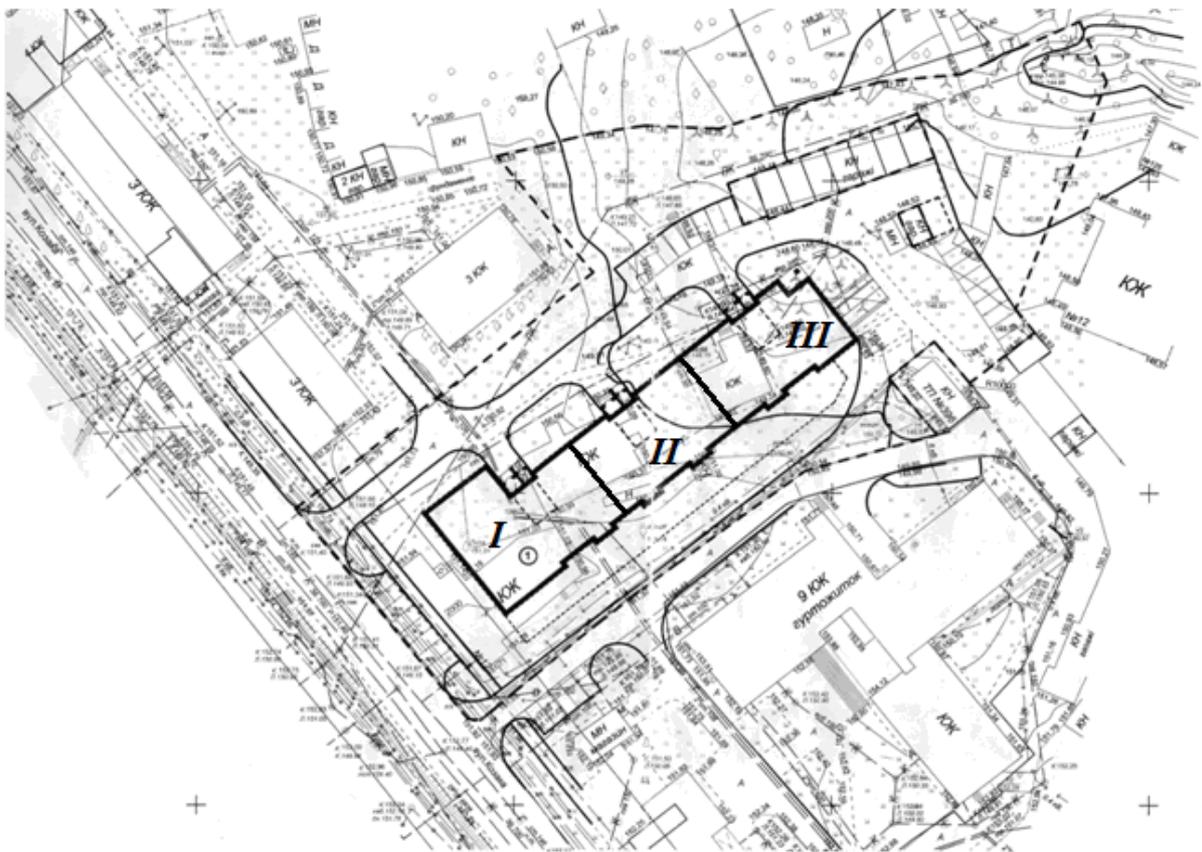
The site of the three-sectioned nine-ten storey house on the str. V. Kozak, 14 in Poltava
